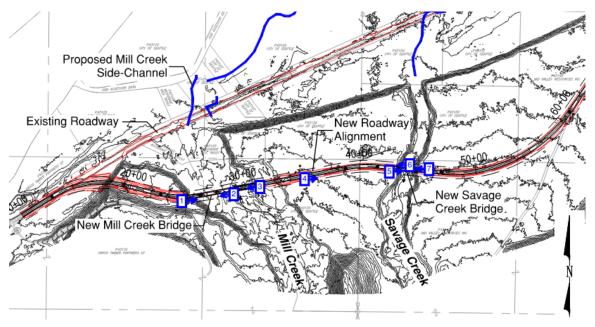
Mill and Savage Creeks Bridge Locations with Photo Locations
